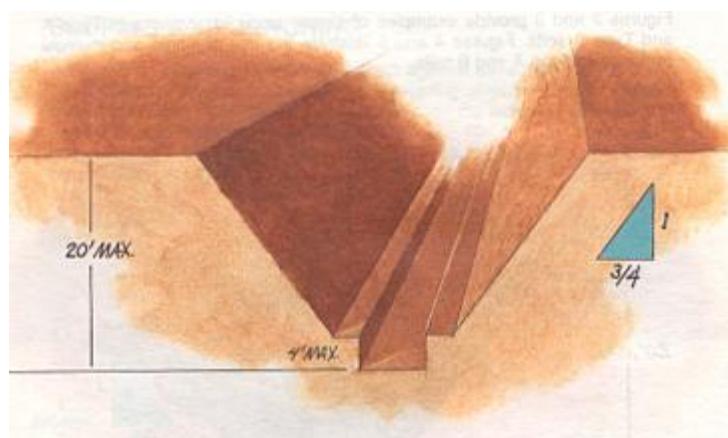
Simple slope excavation in Type A soil with a 3/4H: 1 V slope.
